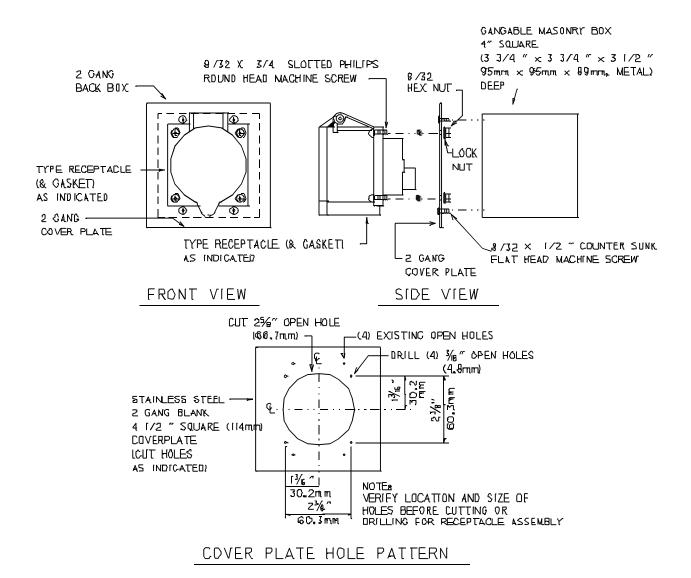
TYPICAL CEE FORM RECEPTACLE MOUNTING DETAIL
